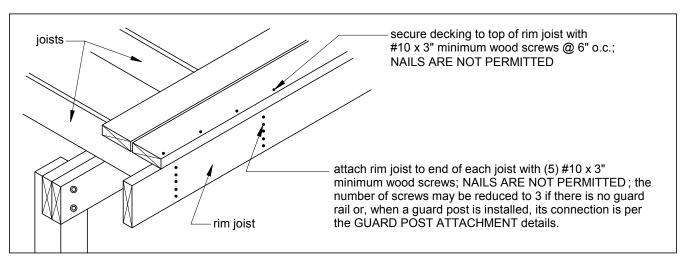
RIM JOISTS CONNECTION DETAILS
